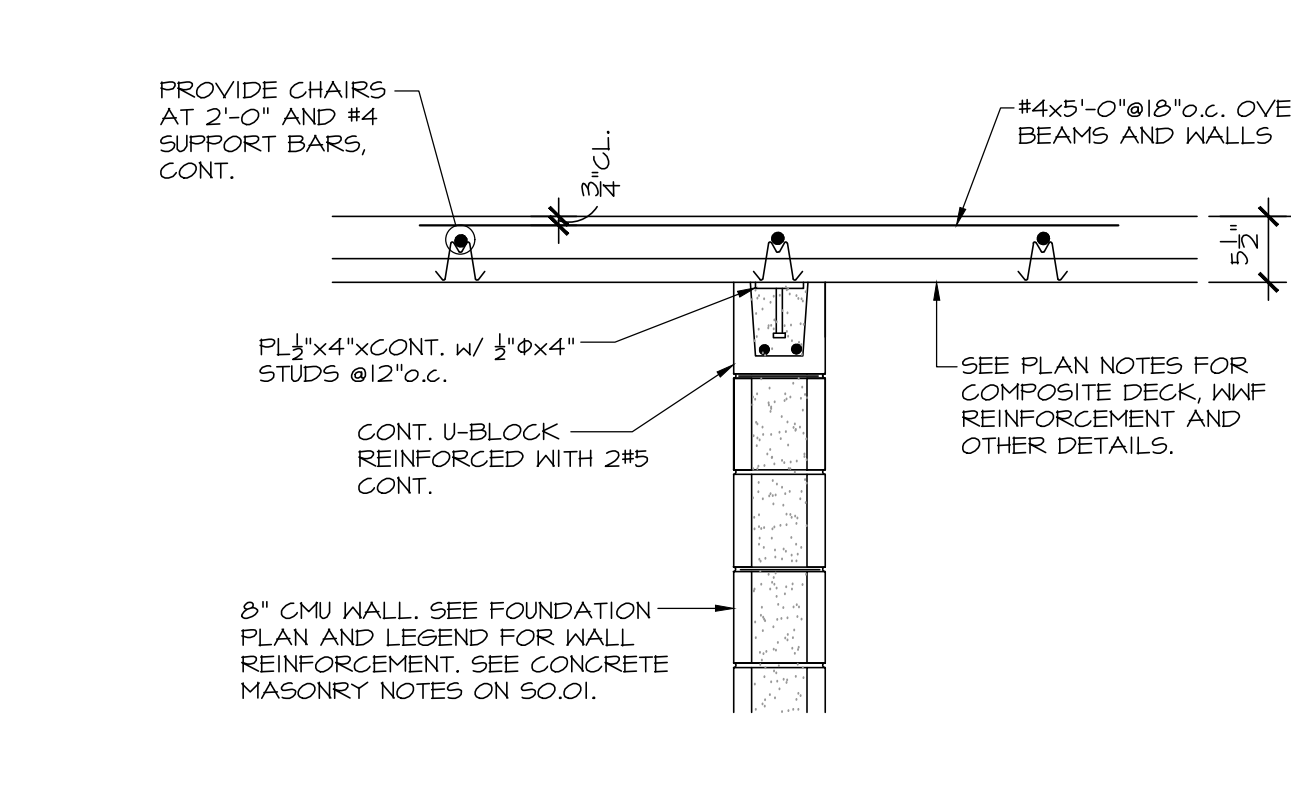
DETAIL AT CONTINUOUS STEEL BEAM BEARING ON MASONRY WALL
